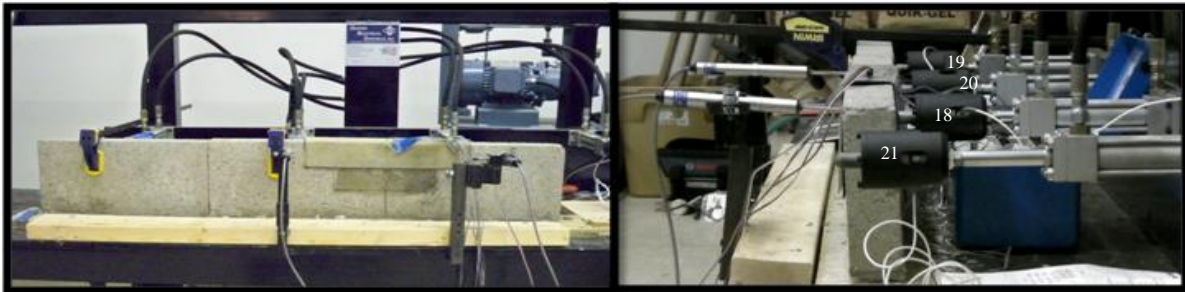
Floodwall Testing Set up and hydraulic piston configuration
